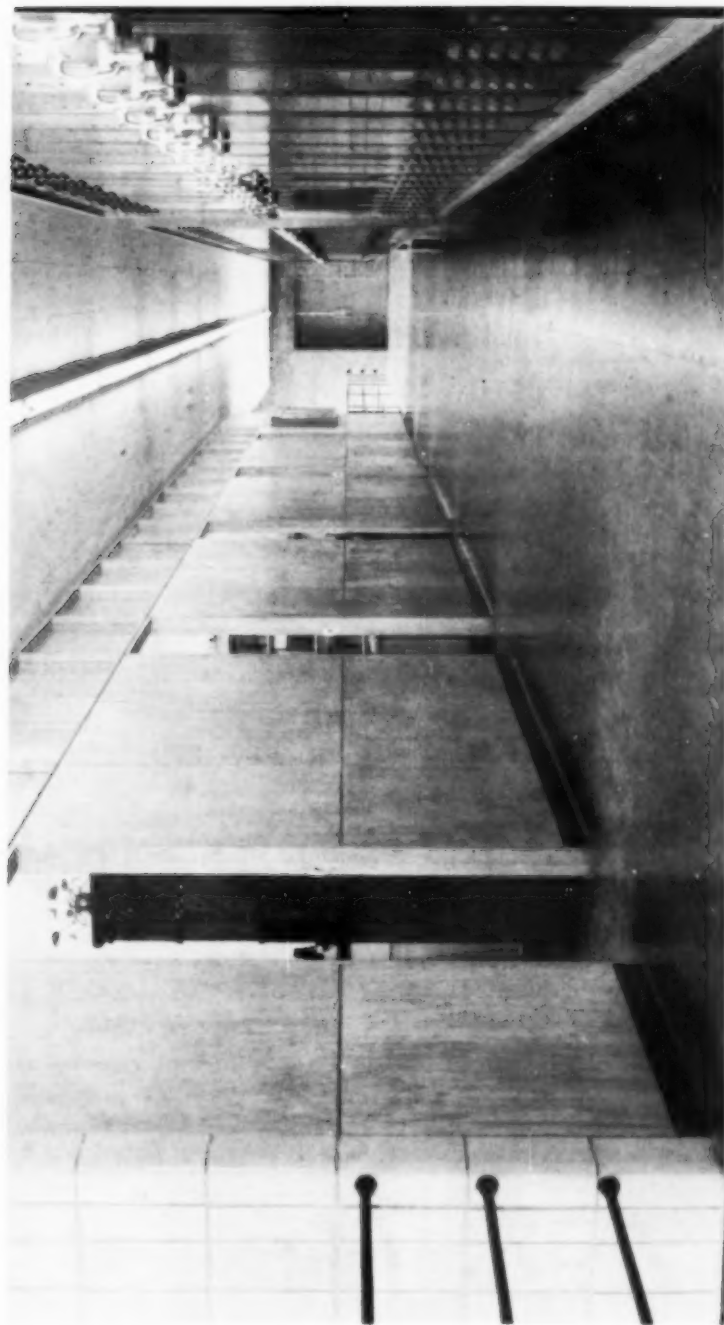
SECOND FLOOR HALL SHOWING OFFICES OPENING FROM THE HALL, DRAKE UNIVERSITY
